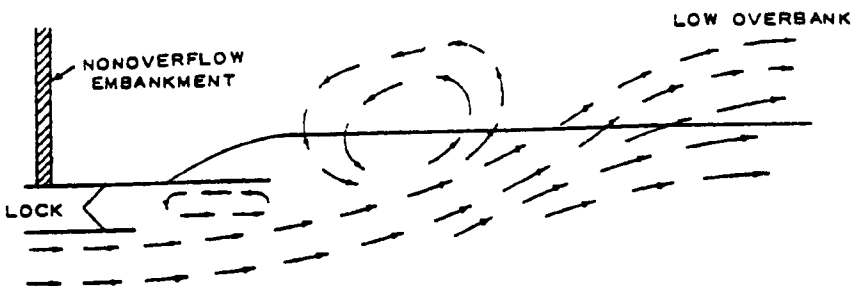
Low Overbank Adjacent to Lock Approach.
